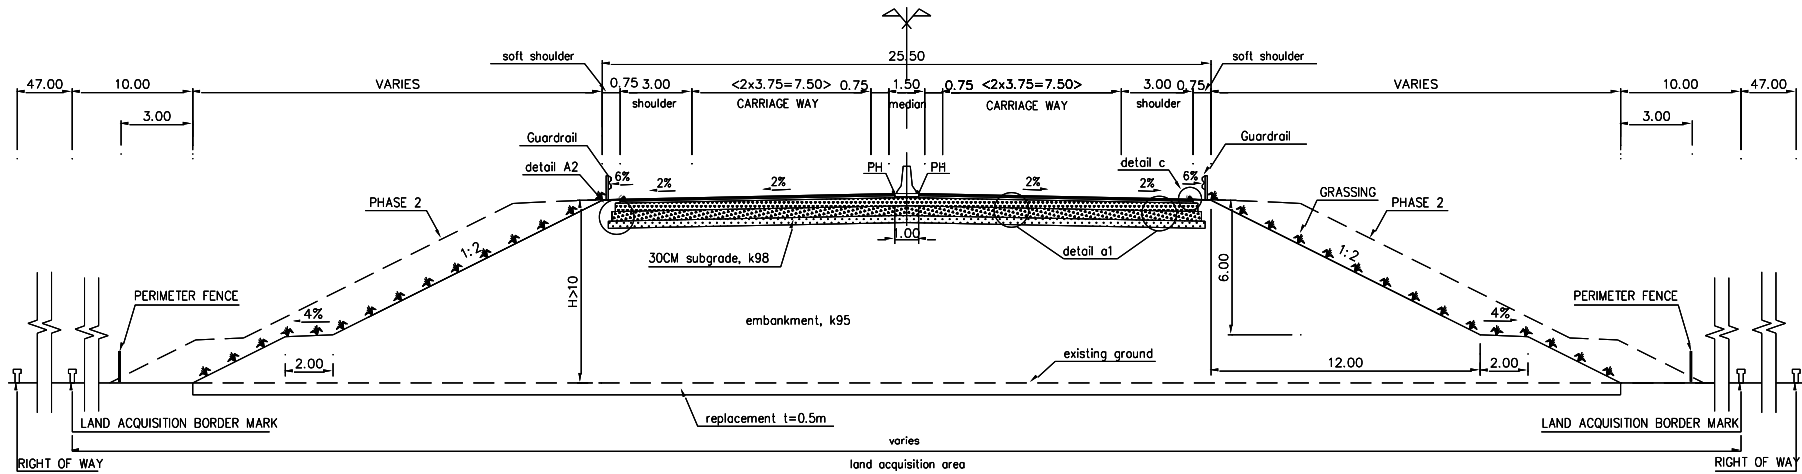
Typical Cross Section of Earth Work Section (Initial Stage)
